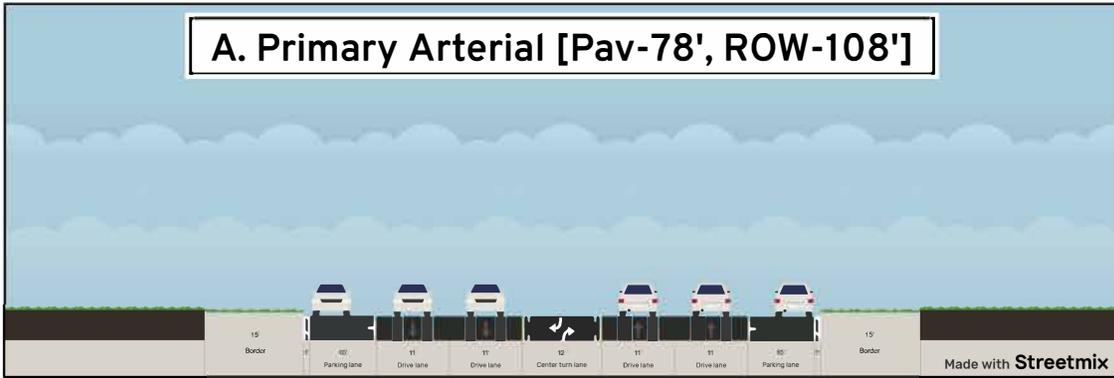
CITY OF HUNTSVILLE COMPREHENSIVE PLAN TYPICAL ROADWAY CROSS SECTIONS DRAFT PROPOSAL
